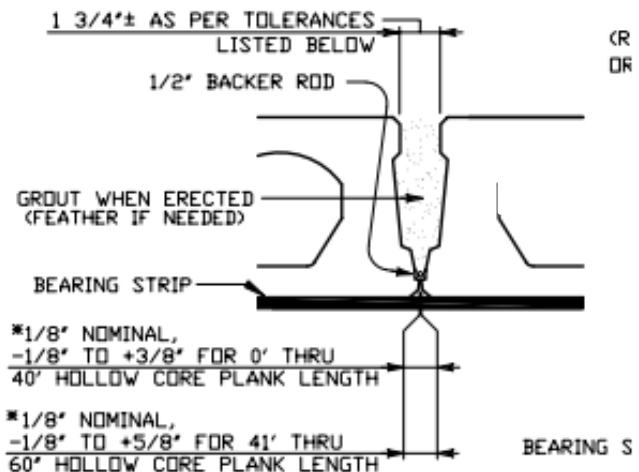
Grouting Keyway Detail (image provided by Nitterhouse Concrete Products)
